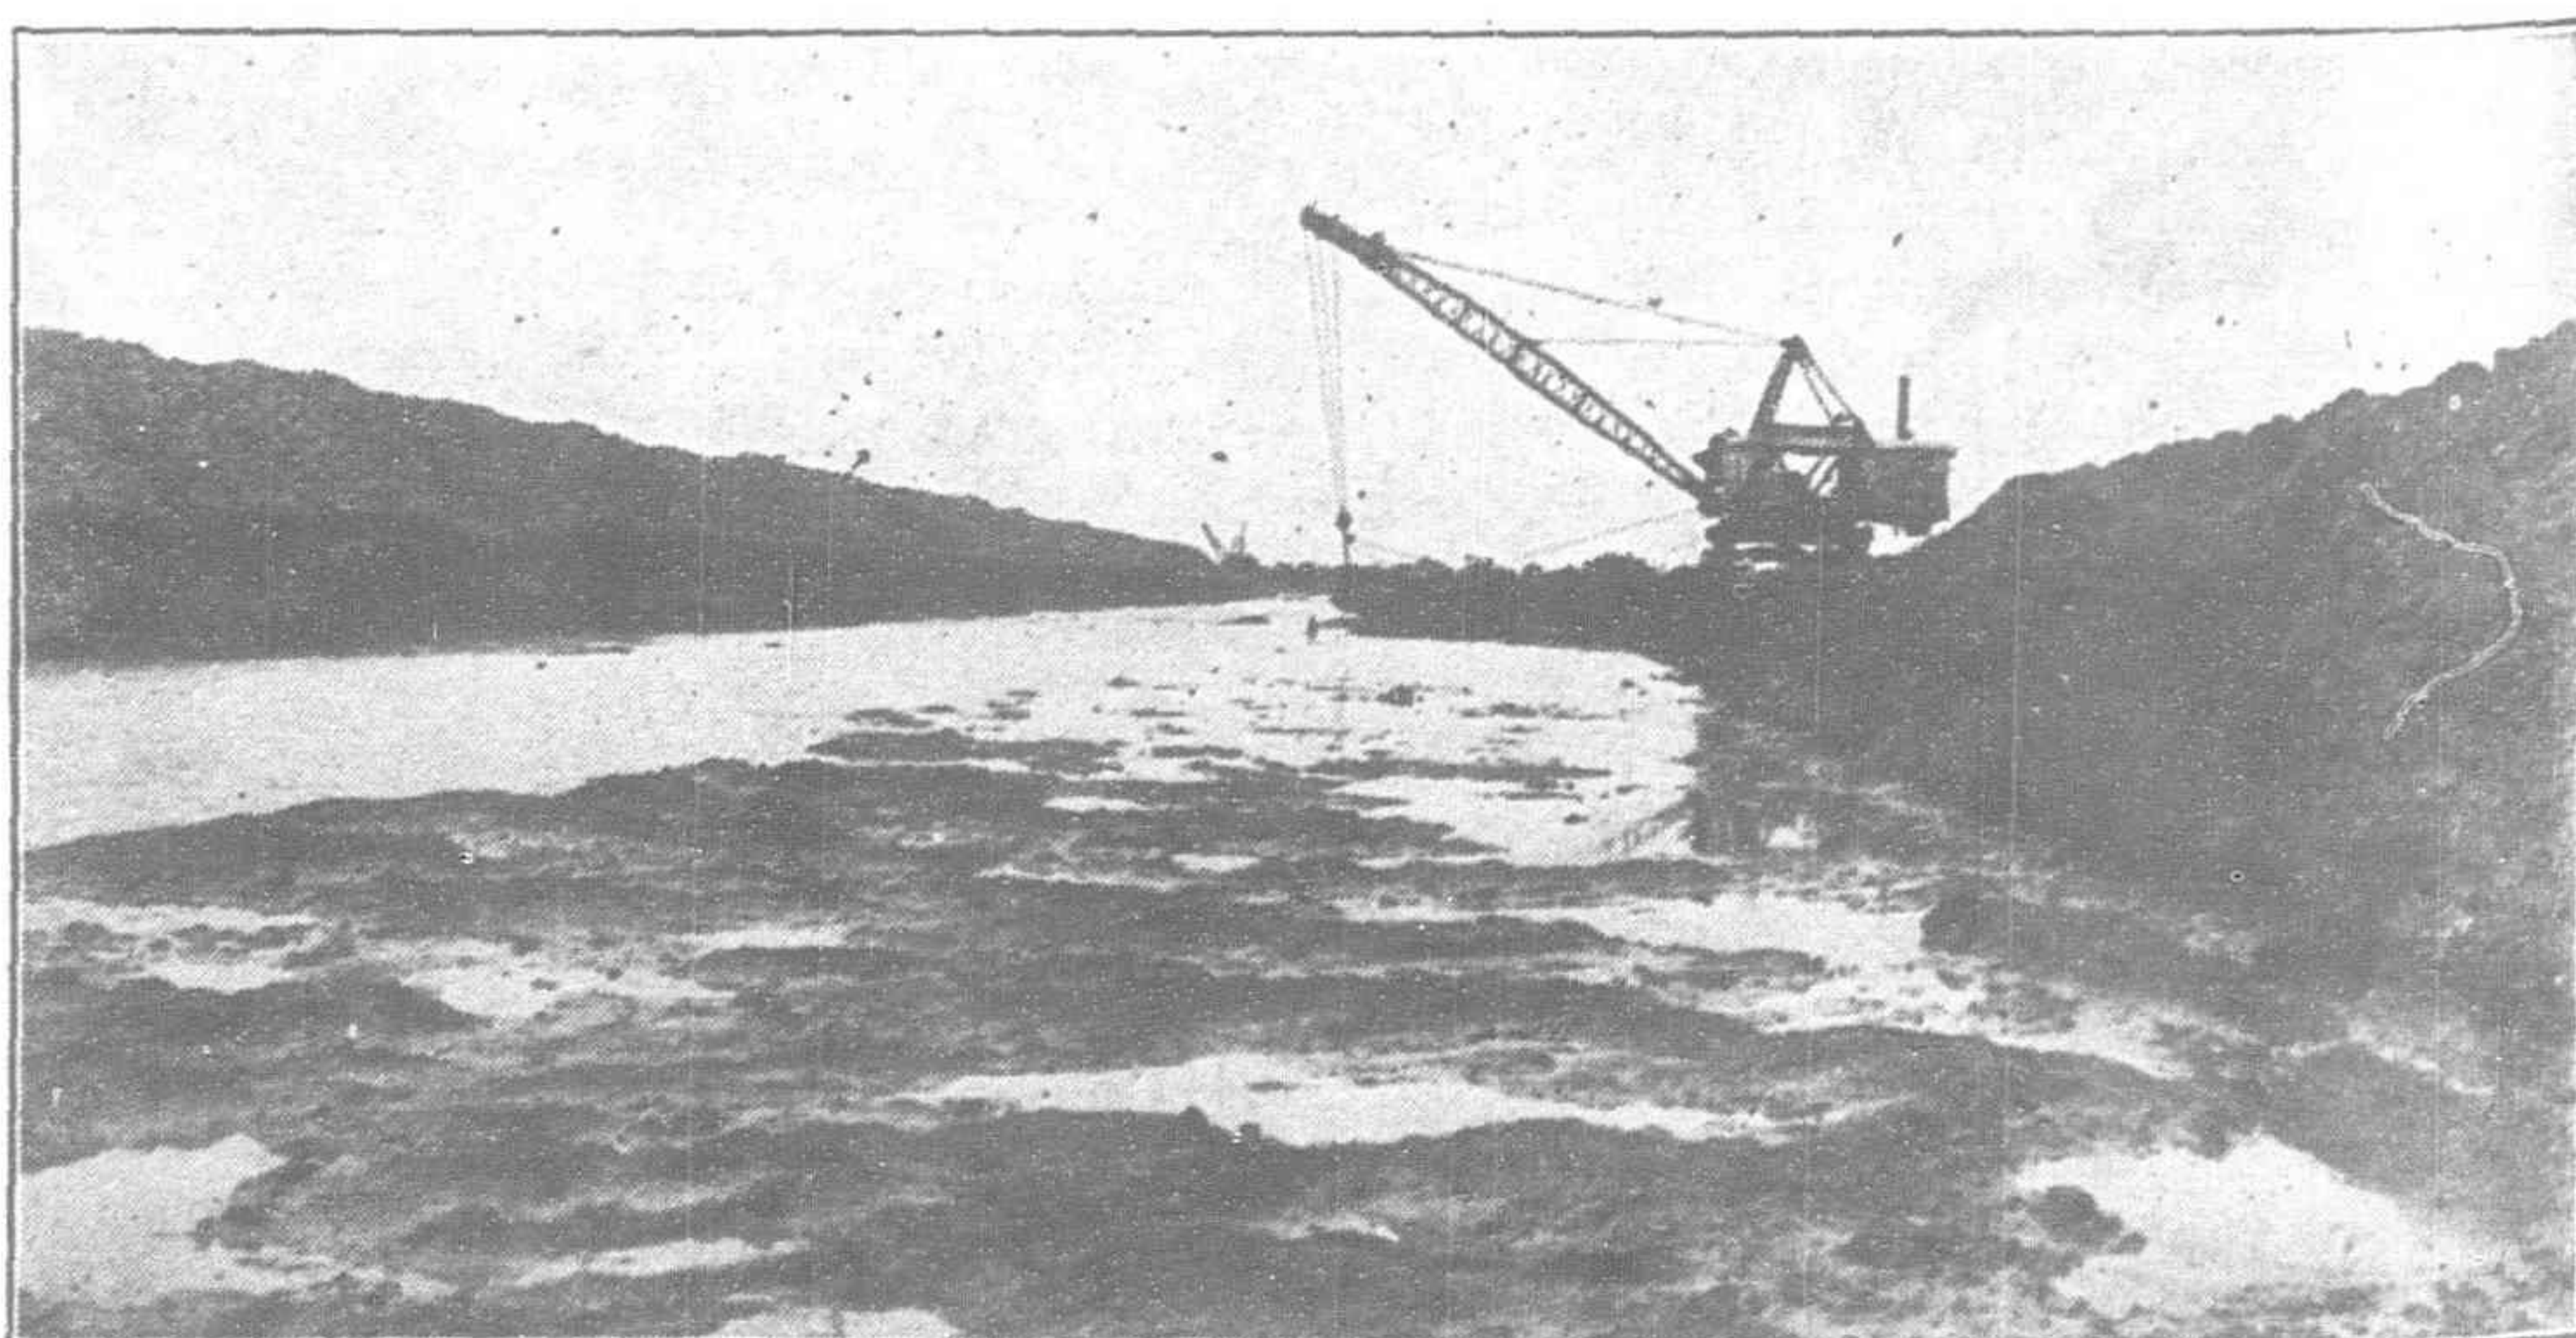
DRAGLINE EXCAVATOR MAKING STOCK SAND PILES
